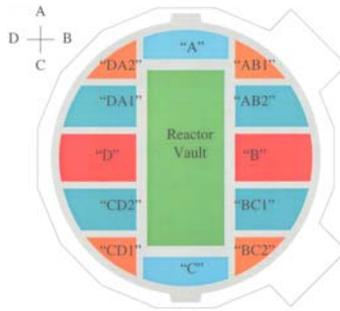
Plan View of Reactor Building Vertical Installation Compartments
